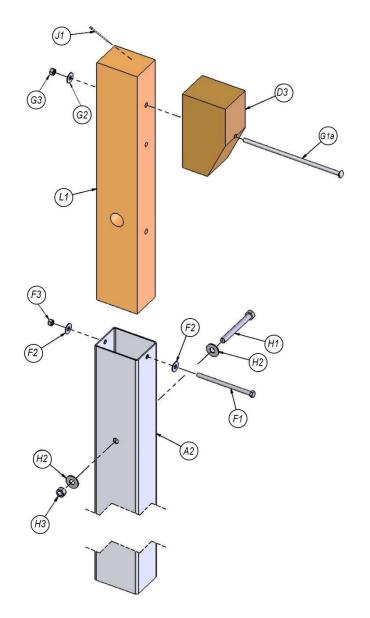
Post 2 – Exploded View (Rail Not Shown)
